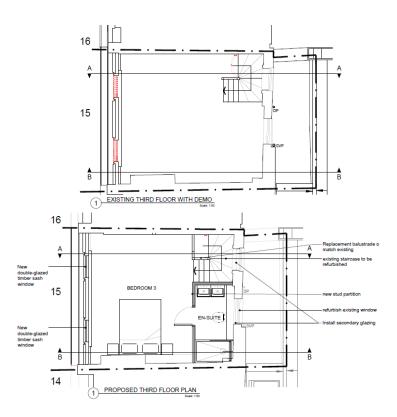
(above): Existing and proposed plans of the third floor showing internal and external alternations proposed
